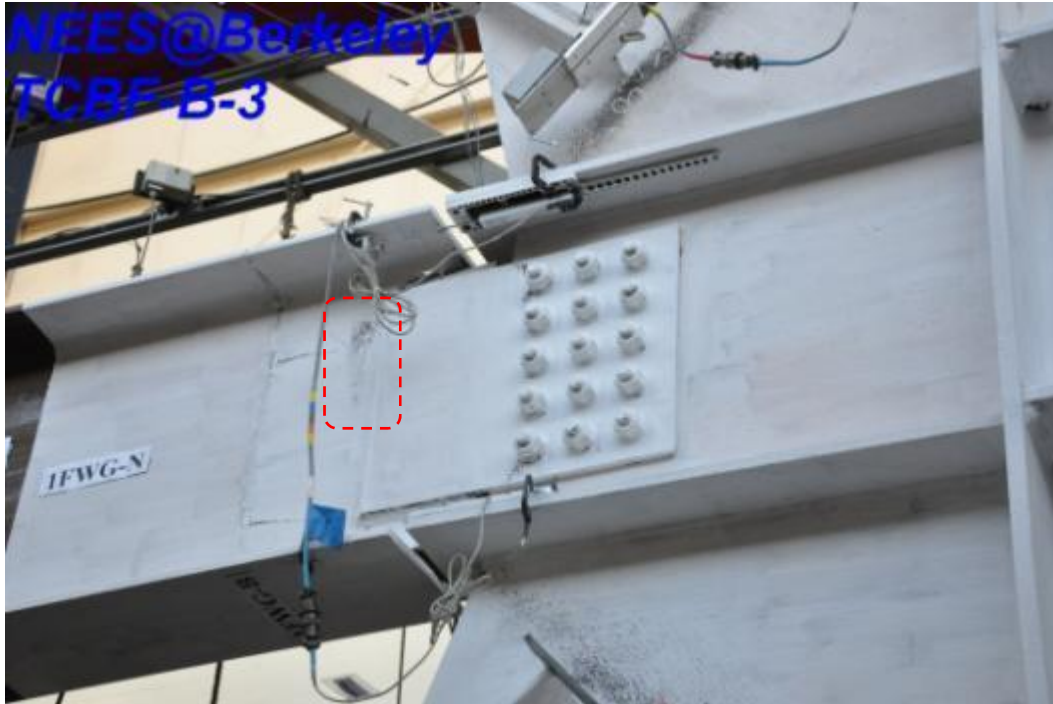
Specimen TCBF-B-3: local yielding in the beam-to-gusset plate splices near the short-slotted holes.
